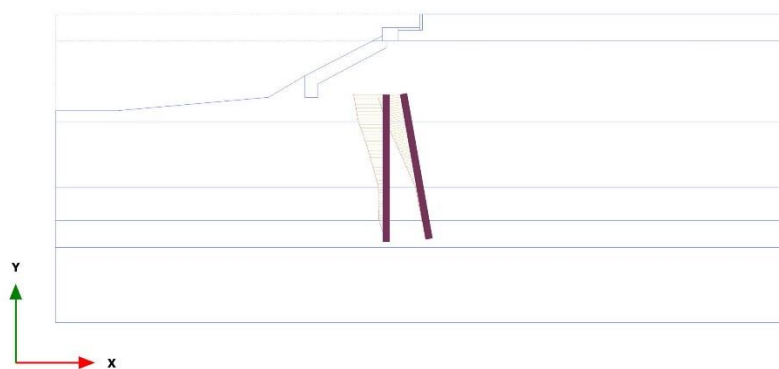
Bridge 2 axial forces in lower section at SLS longitudinal
